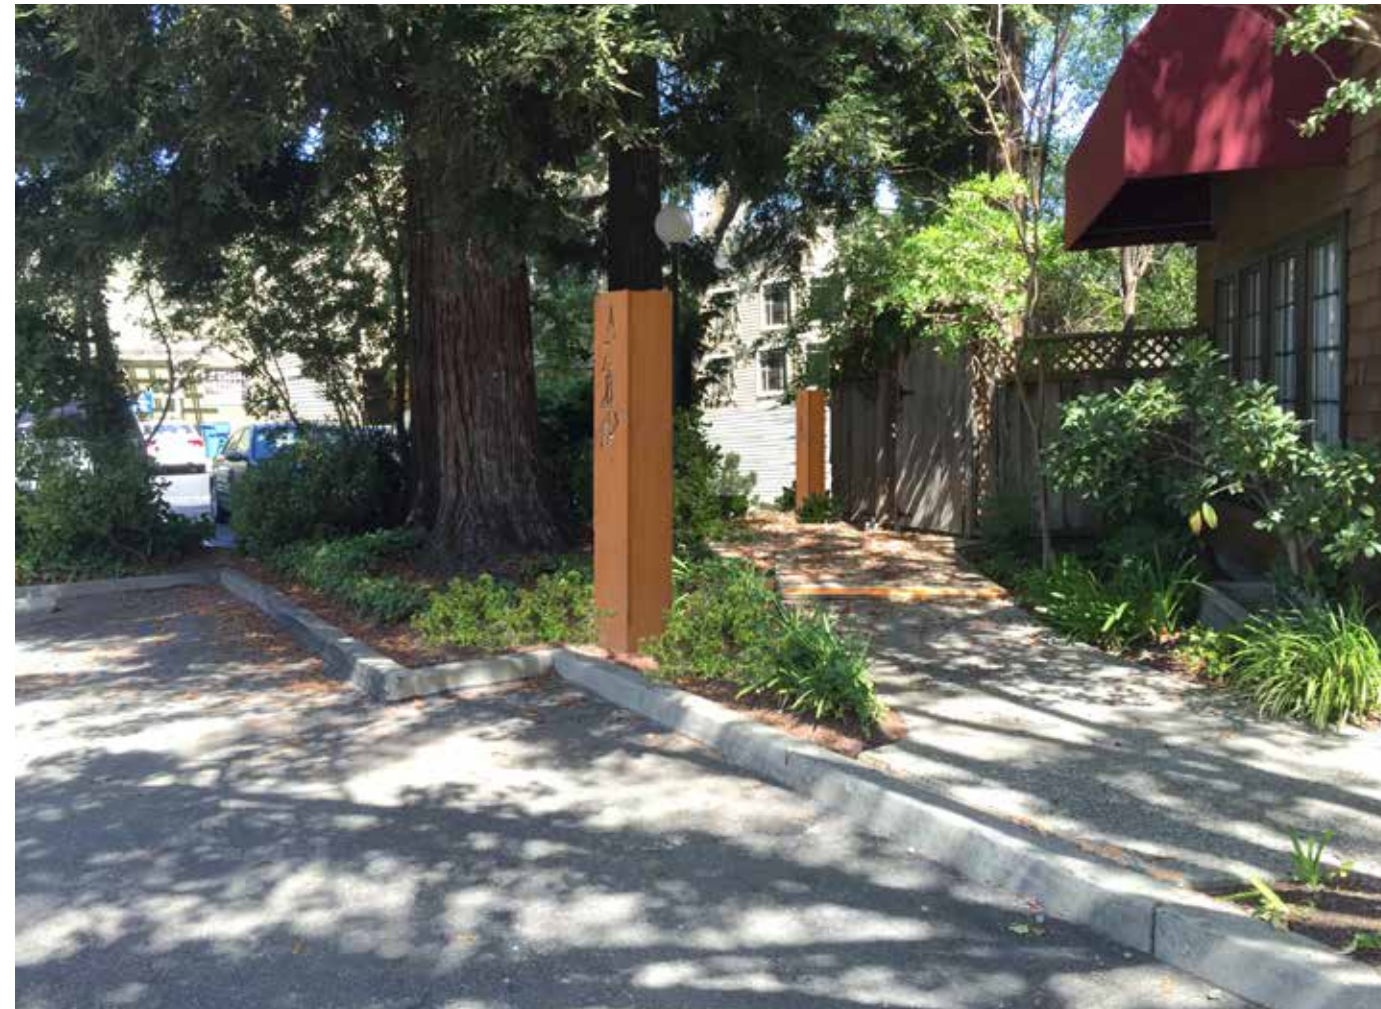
North-south pedestrian connection, with creek icons, looking north toward Clock Tower
